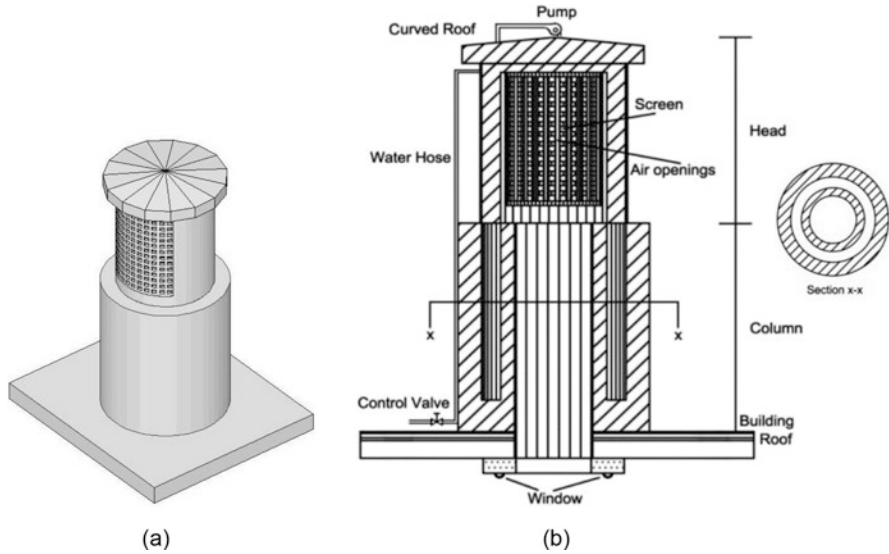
(a) View of the innovative wind tower design and (b) a schematic cross-section with details [52, 53, 101]
